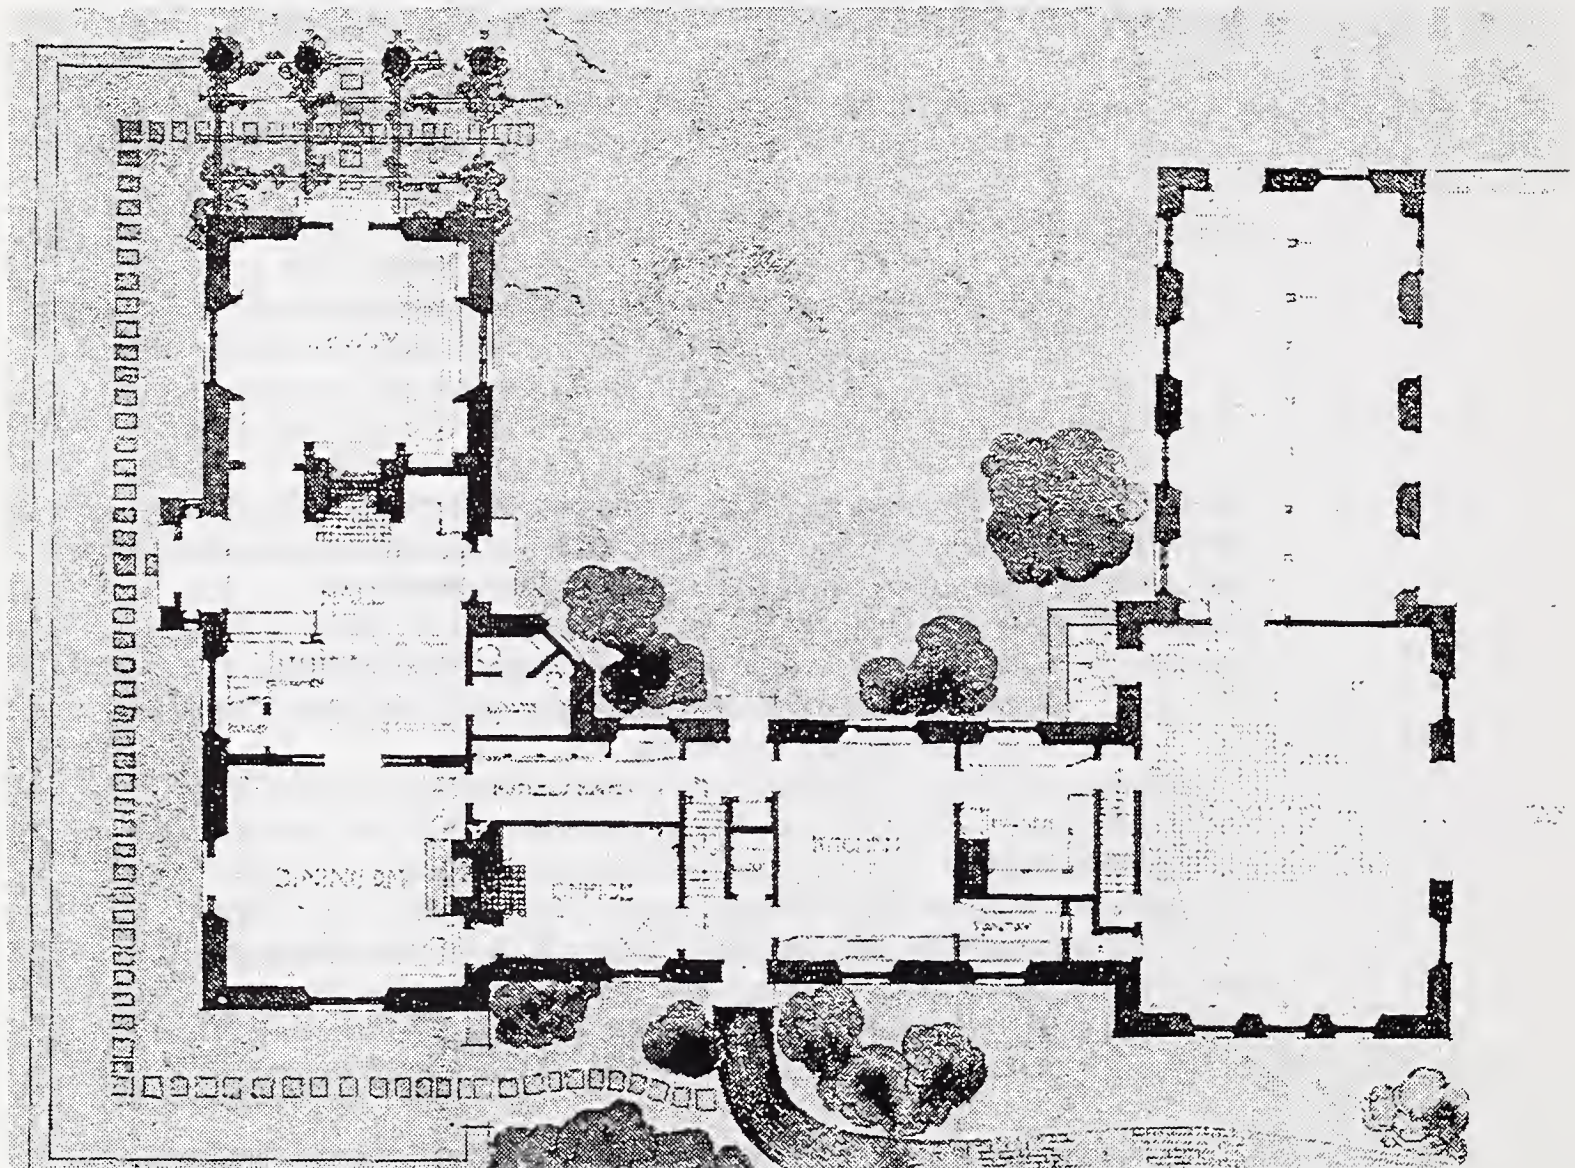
A. Plan of First Floor from The Architectural Review, January, 1904.
